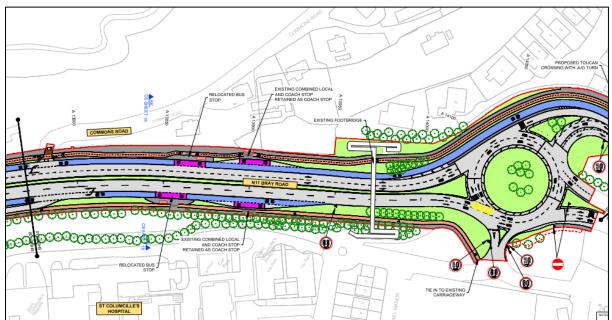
Extract from General Arrangement Drawings at Hill Road junction (Sheet 40)
